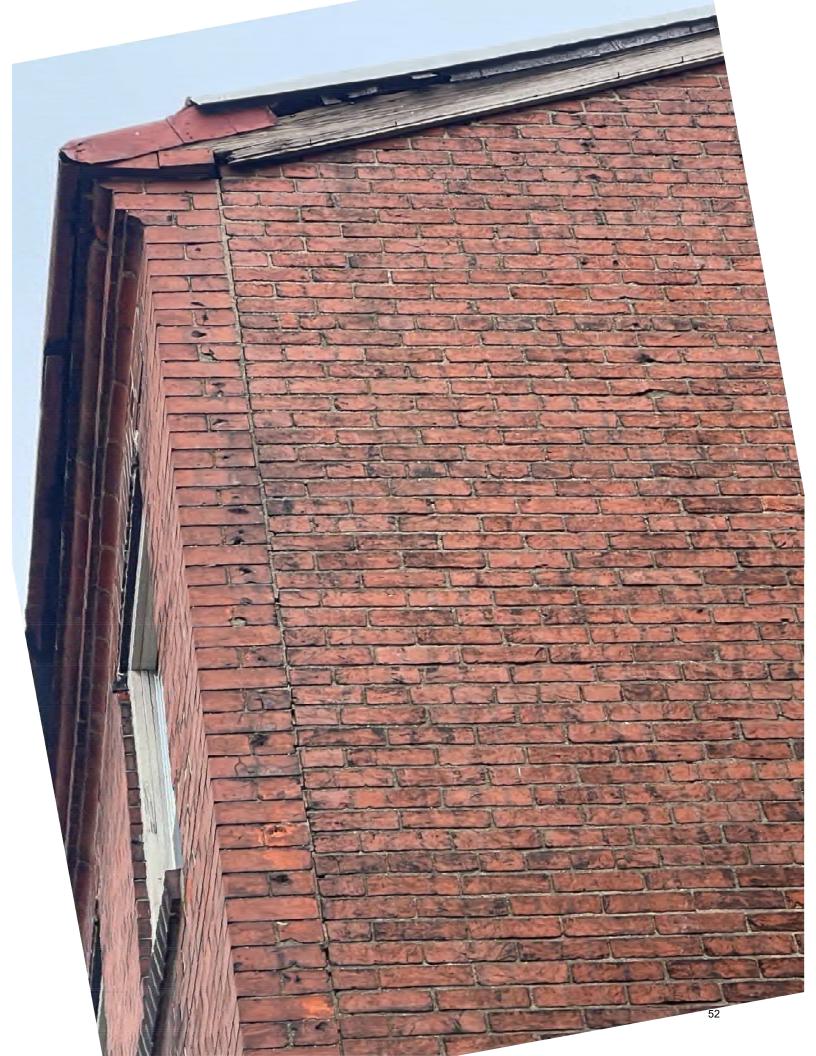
Shows closer look at deteriorated bricks. Note damaged faces of the bricks, cracks within the body of some bricks and the filling of gaps with cement
